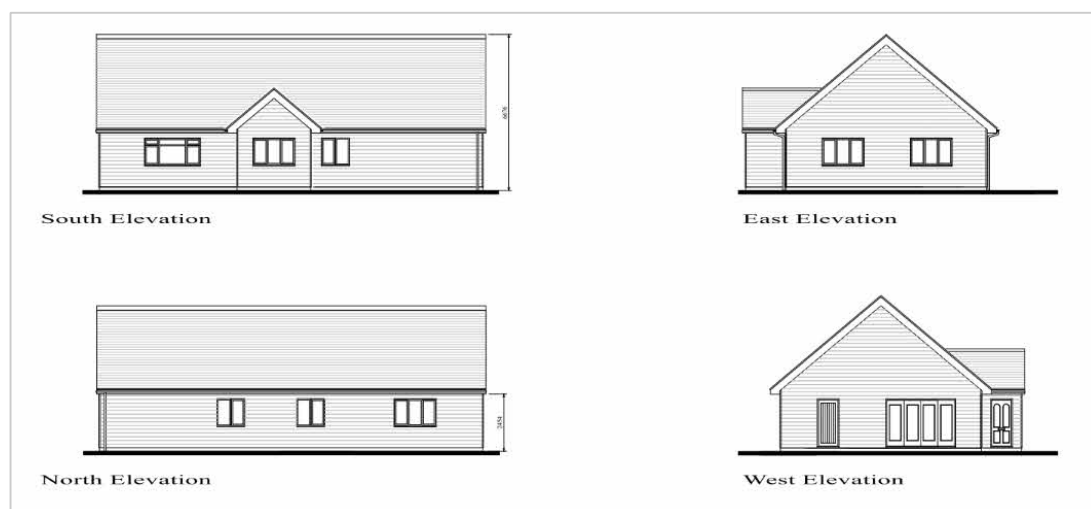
PROPOSED PLANS AND ELEVATIONS (23/3643)
